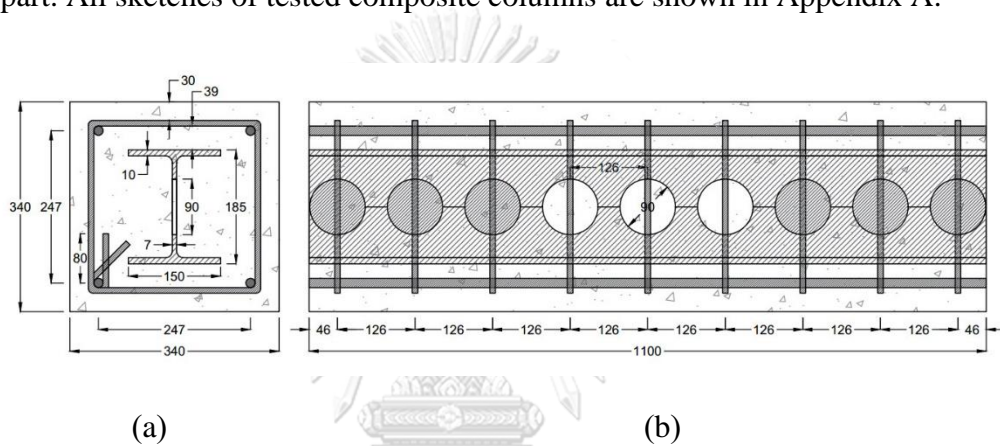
Typical reinforcement details of CECS column (column C1-126); (a) cross section; and (b) longitudinal section (dimensions in mm).
